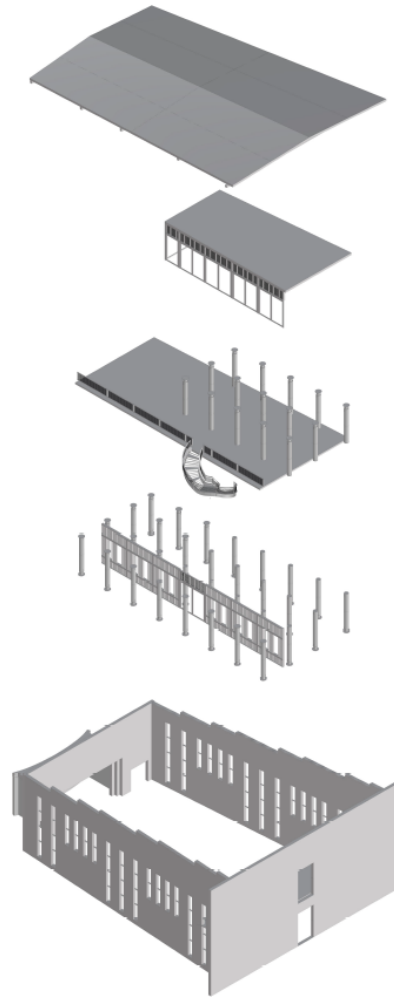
Exploded axonometric of the library construction: new columns, interior façades and foundations, with the existing roof retained and insulated (Source: by author).
